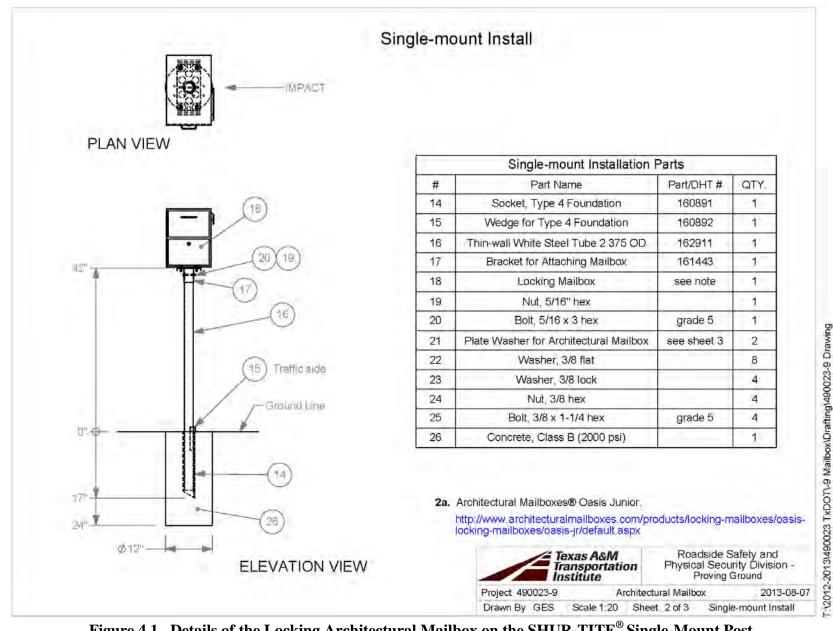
Details of the Locking Architectural Mailbox on the SHUR-TITE® Single-Mount Post.
